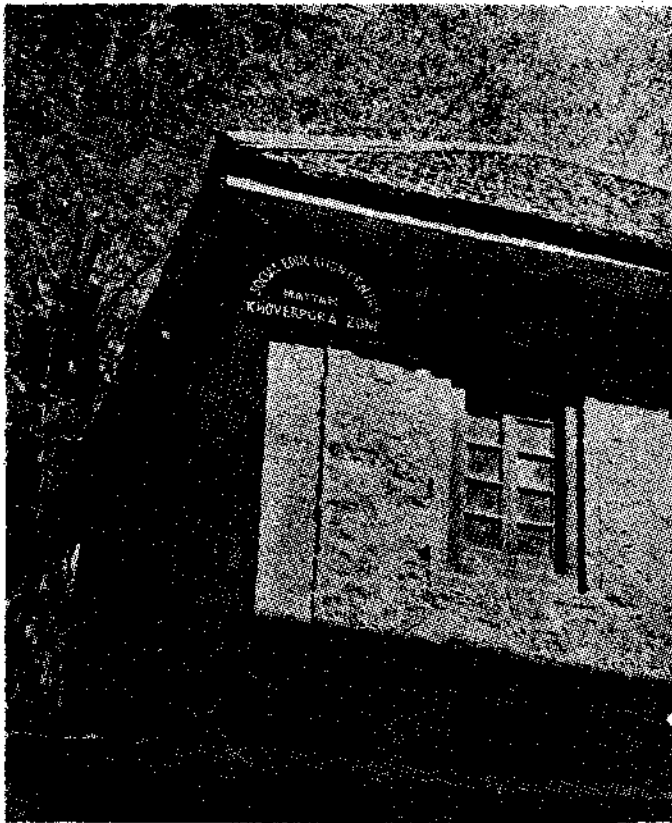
Separation of the Brick Masonry Corner Pier from the Rubble wall.
